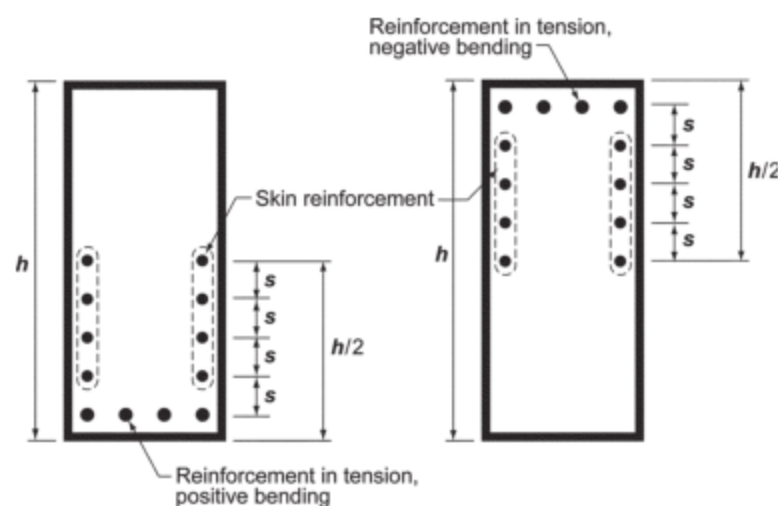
Skin reinforcement for beams and joists with $h > 36$ in. (Code Section R9.7.2.3).
